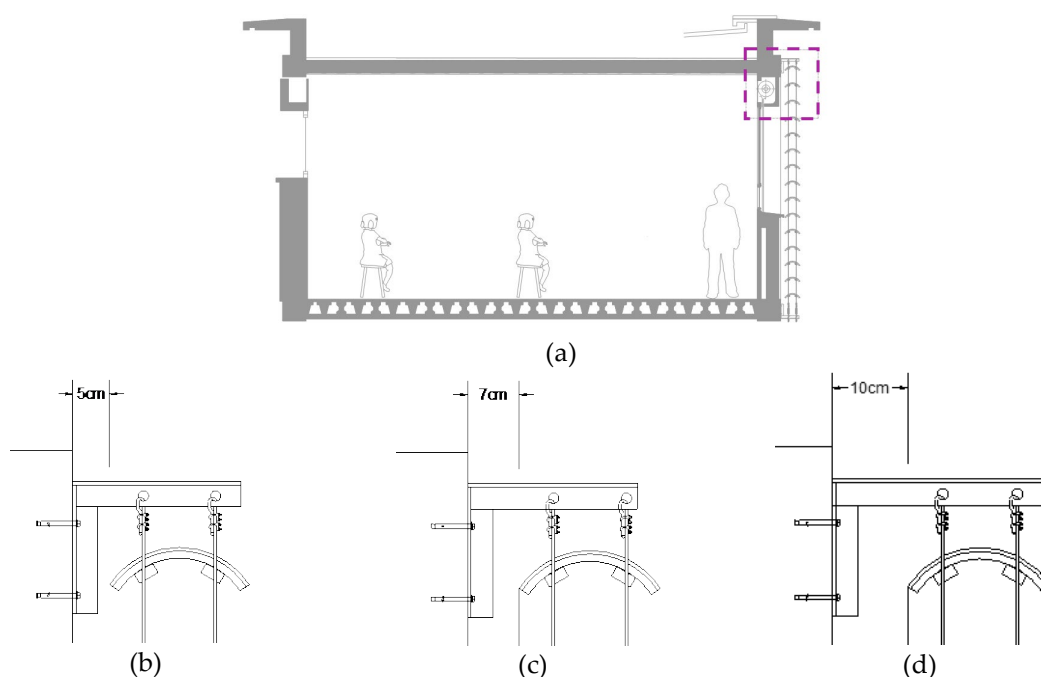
General section of the classroom and sections of tile system separated from the exterior wall 5 (b), 7 (c) and 10 (d) cm.
